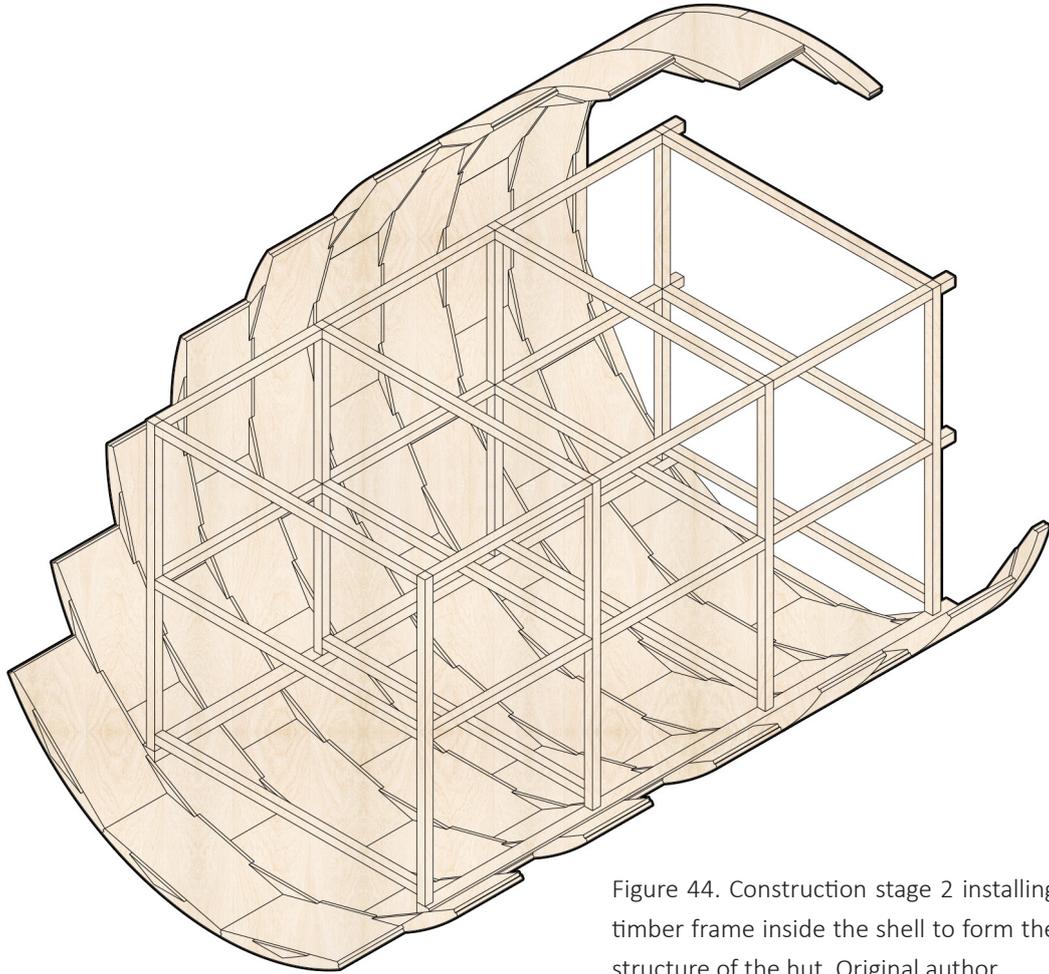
Construction stage 2 installing timber frame inside the shell to form the structure of the hut. Original author
